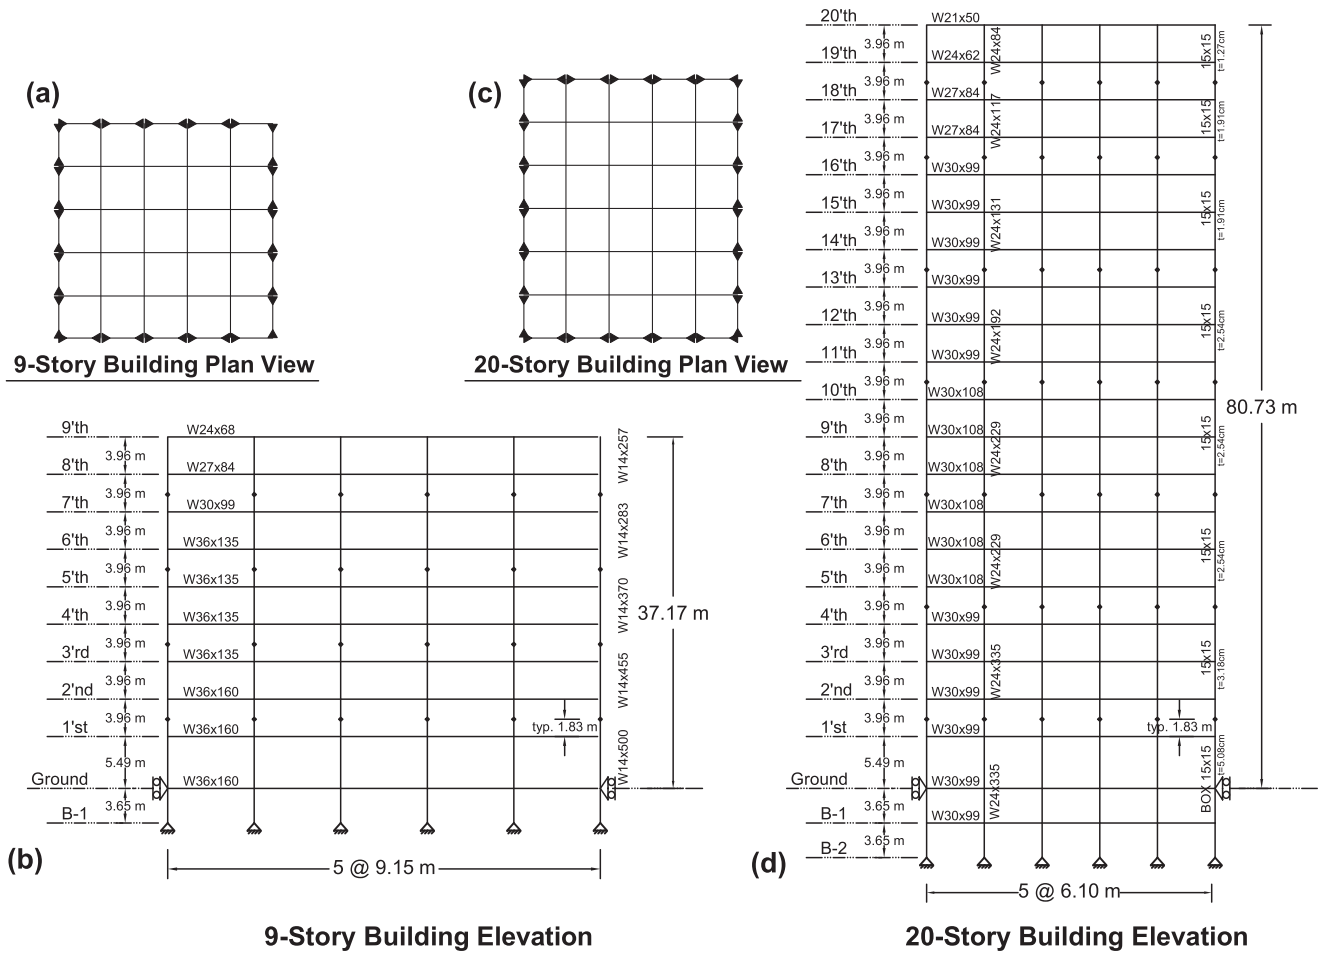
| Plan and elevation views of the (a,b) 9-story and (c,d) 20-story steel moment-resisting frames designed for the SAC Phase II Project. Plan views show the locations of perimeter moment-resisting frames (solid triangles) and gravity framing.
